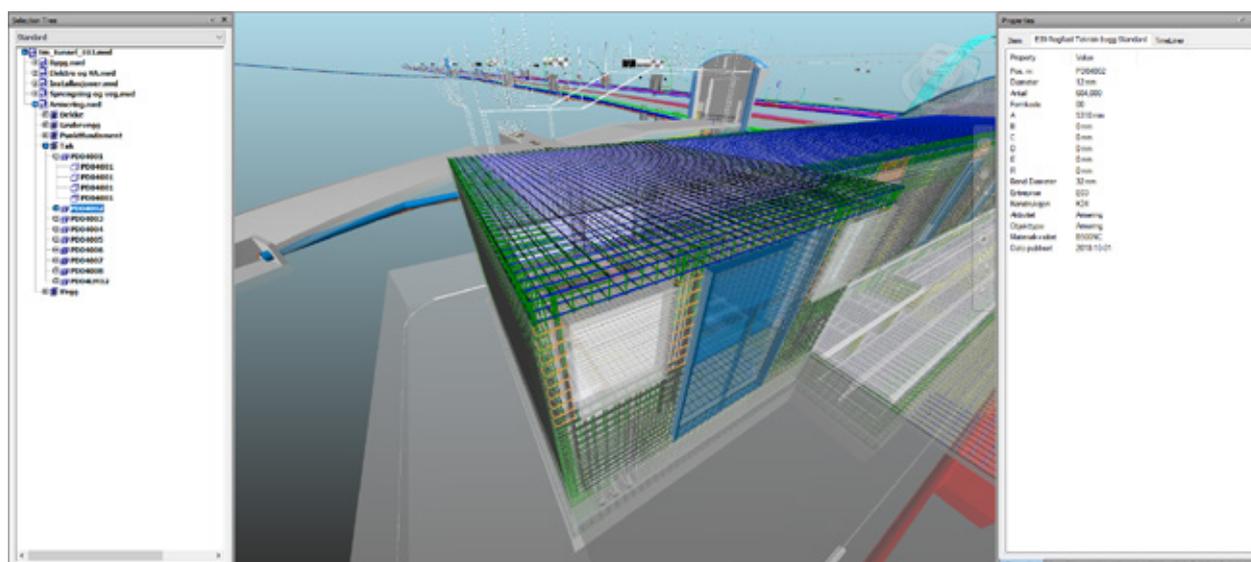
Example of a rebar model of a technical building from E39 Rogfast.
